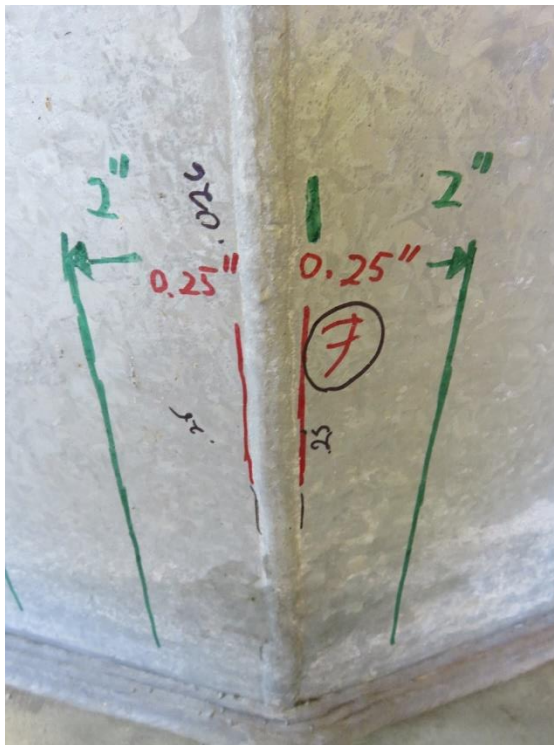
State of Cracks: Specimen 33-3-12-TX-A2 – Bend 7
